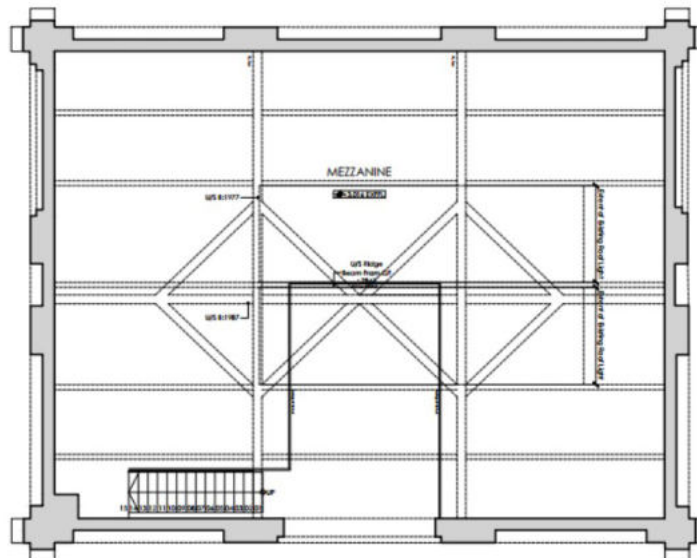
Current Mezzanine Floor Plan Showing Intricate Roof Structure
